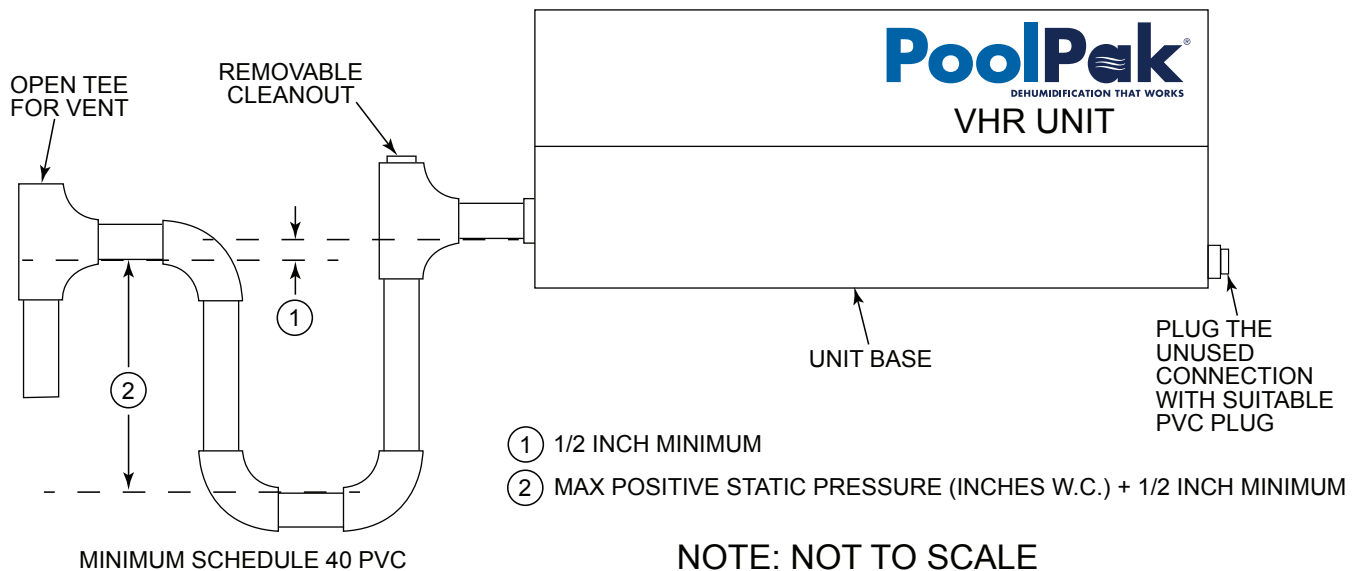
Positive Pressure Condensate Drain Piping Cross Section
